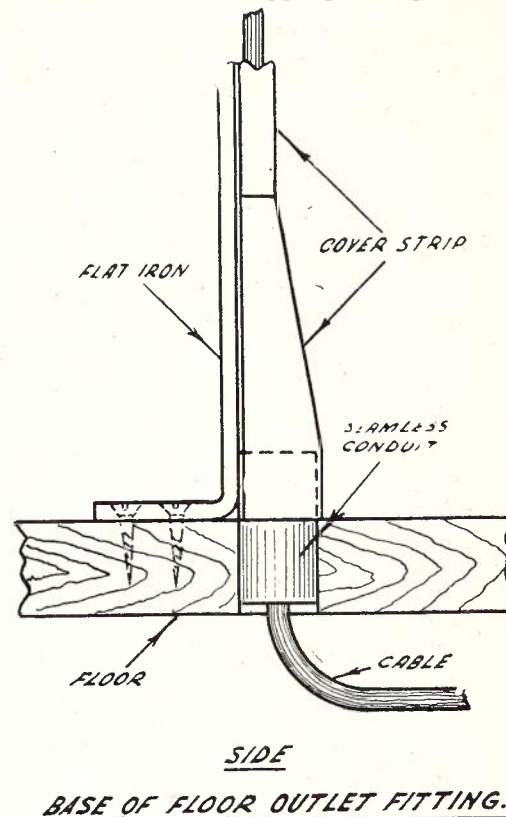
Detail Showing Base of Floor Outlet Fitting.
